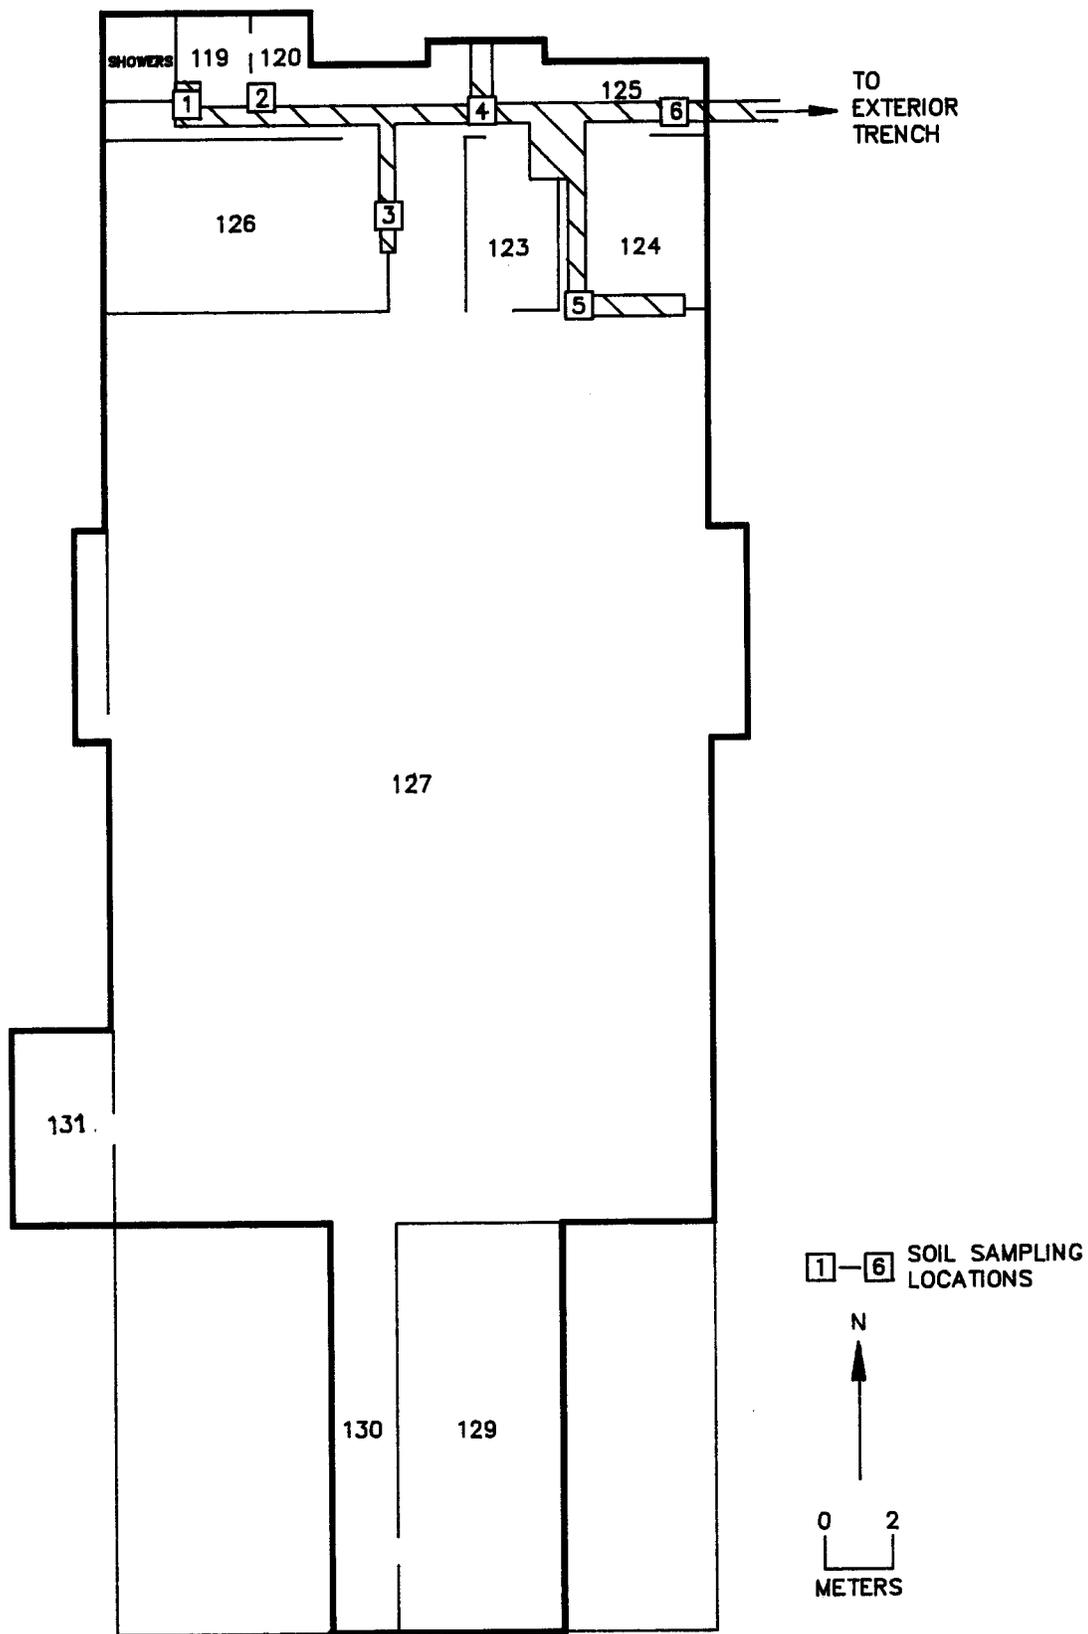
Location of Interior Soil Samples from Excavated Trenches
